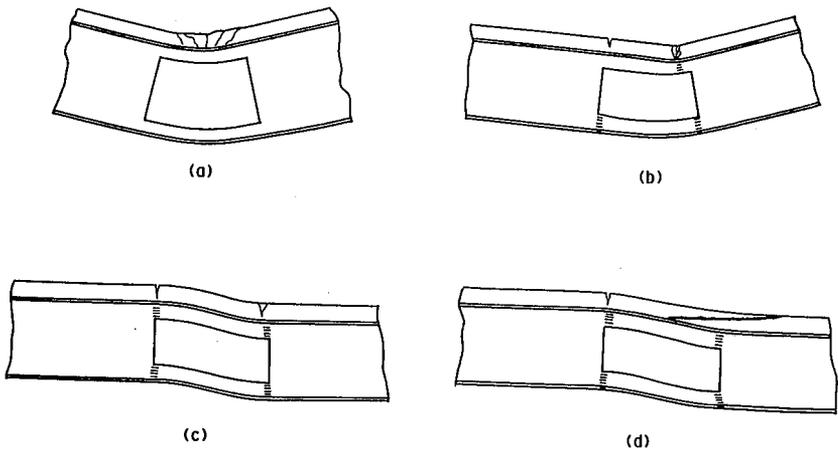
Failure Modes at Web Openings in Beams with Solid Slabs (a) Pure Bending, $V=0$; (b) High M/V ; (c) Lower M/V , Concrete Crushes; (d) Low M/V , Diagonal Tension Failure in Concrete
